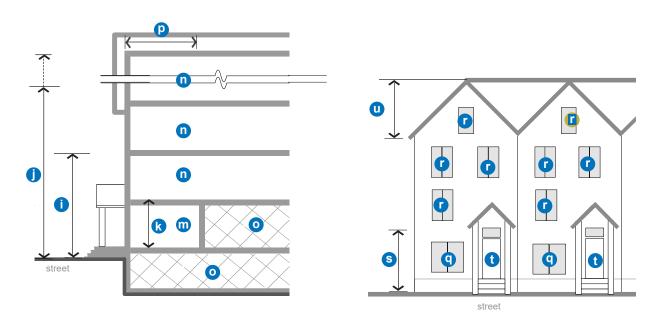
(D)(2) Townhome Building: Height and Use Requirements
